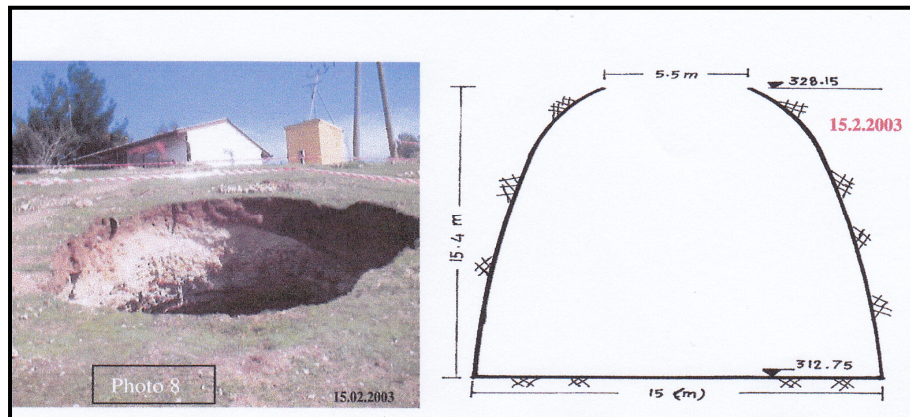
Photographs of the right bank sinkhole showing development stages and sketch indicating mapped dimensions [9].
